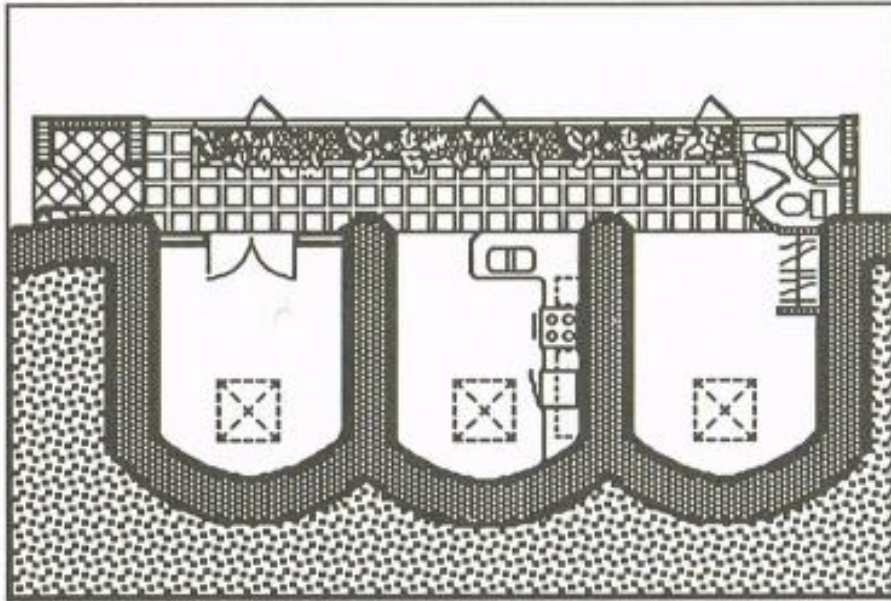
Floor plan of U Module Earthship (skylight shown in dotted line) (Reynolds, 1990, p. 54)
